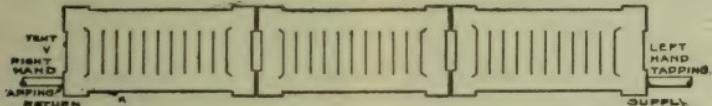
Assembled Three Horizontal Sections in Single Tier One and Two-pipe Steam
